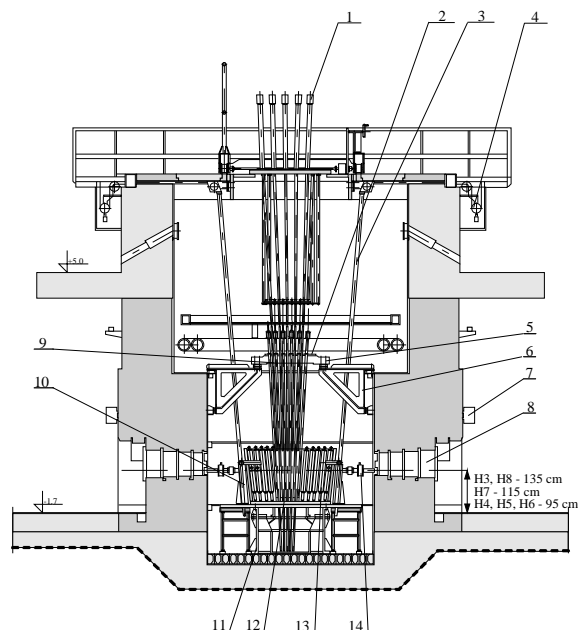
Vertical section of the MARIA reactor. 1. control rod drive mechanism, 2. mounting plate, 3. ionisation chamber channel, 4. ionization chamber drive mechanism, 5. fuel and loop channels support plate, 6. plate support console, 7. horizontal beam tube shutter drive mechanism, 8. beam tube shutter, 9. fuel channel, 10. ionization chamber shield, 11. core support structure, 12. core and reflector support plate, 13. reflector blocks, 14. beam tube compensation joint.
